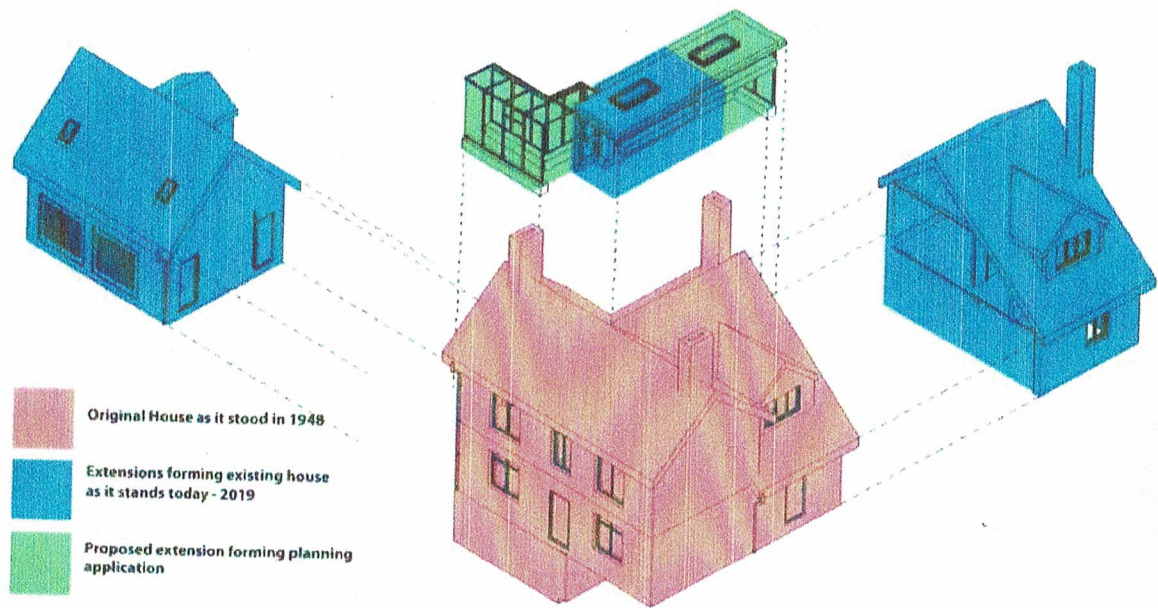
3D View showing volume of original house, existing building as it stands today and proposed extension.
